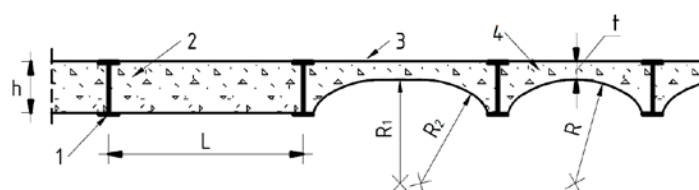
Prussian vaults from brick aggregate concrete 1 – steel beams, 2 – slab, 3 – barrel vault, 4 – cylindrical vault
